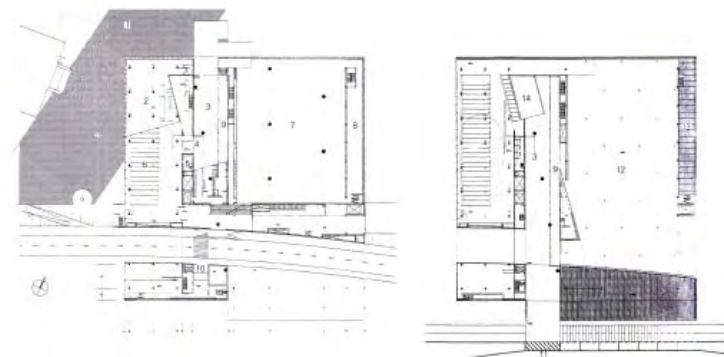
Park (left) and Dike level (right) floor plans of the Kunsthal
